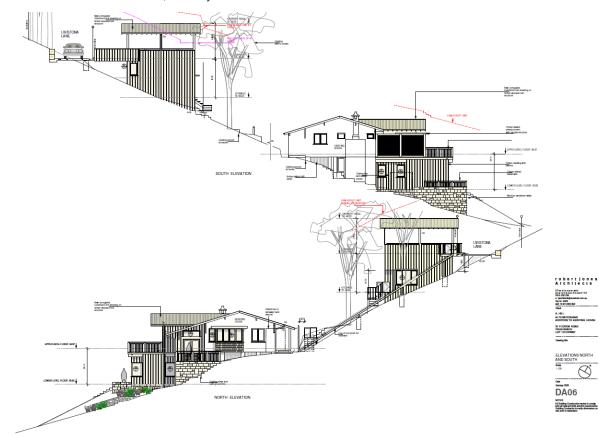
Elevations North and South Source: Robert Jones Architects, January 2021
